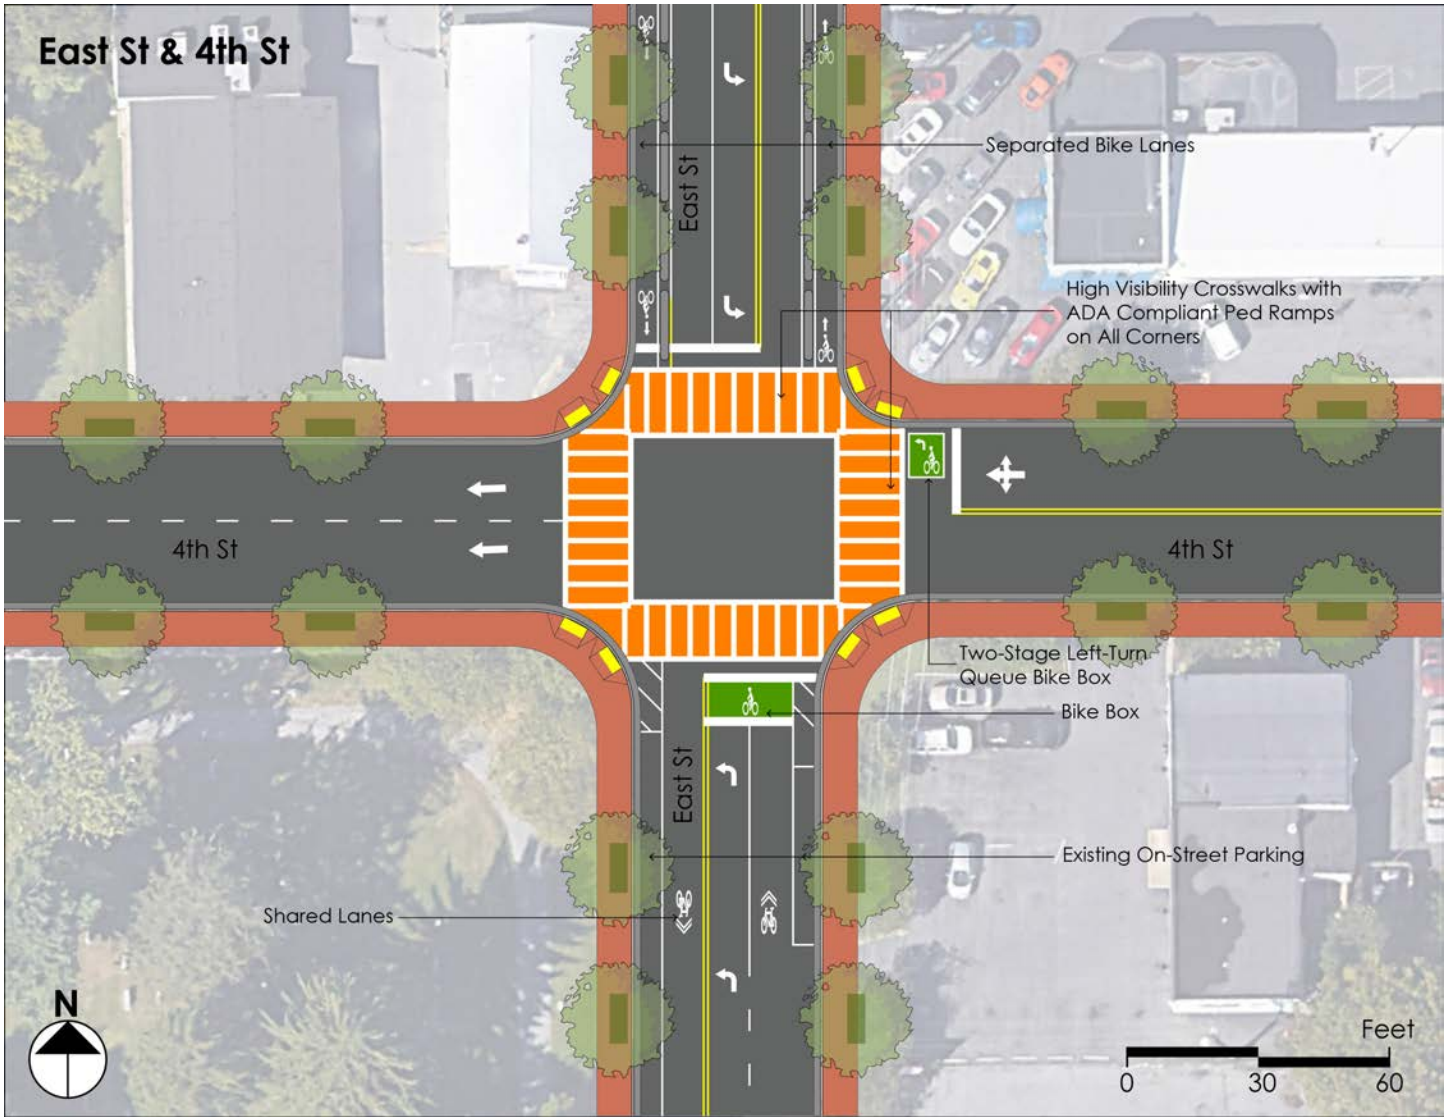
Proposed Intersection Design - East Street and 4th Street
